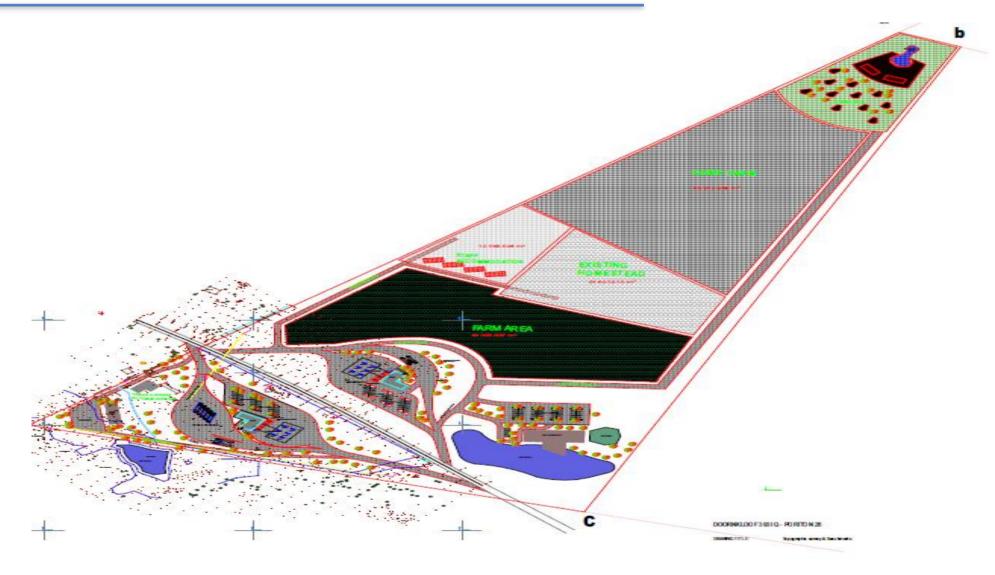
Lay out plan for proposed development (Mawenje 2017)
